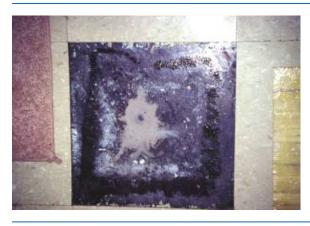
Tile adhesive that failed to cure because of water in the concrete and high pH. The tile can be removed by hand. The floor is a concrete slabon-grade. The water visible in the photo evaporates into the room after several minutes. Its source may be liquid water wicking up from the sub-slab fill or water vapor migrating through the slab.
